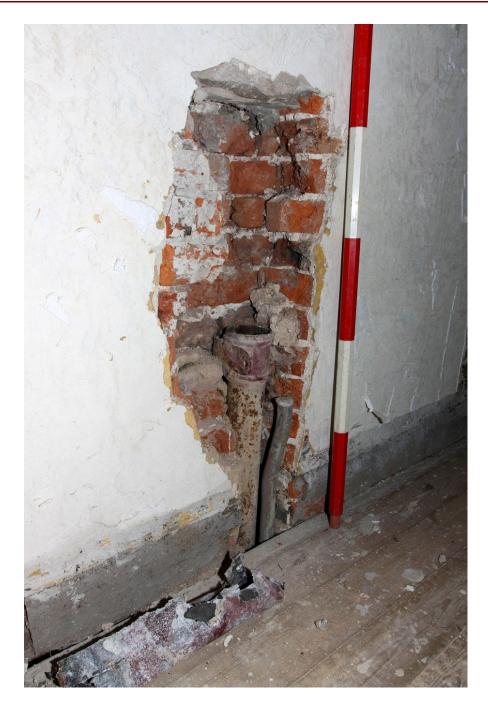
Pipe-work chased into wall in first floor passage, looking SE
